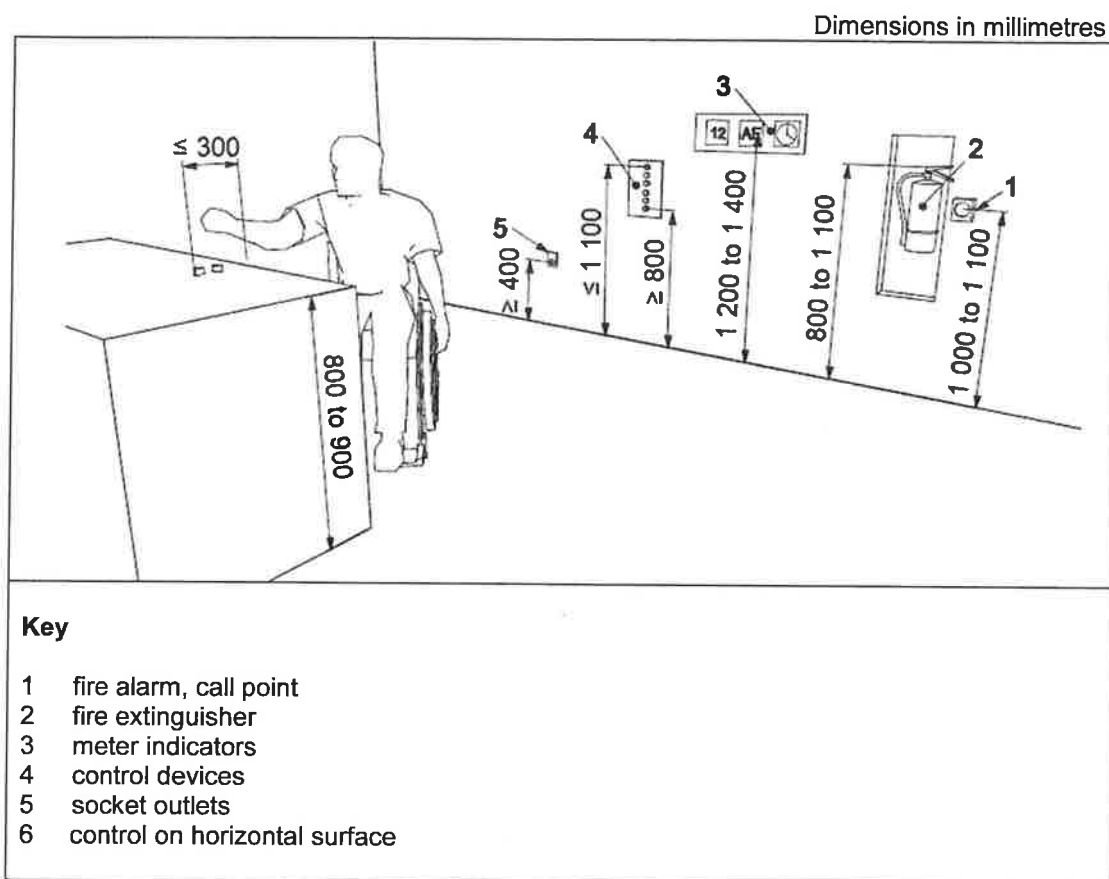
Heights of switches, socket outlets, meter indicators and controls on a horizontal surface
